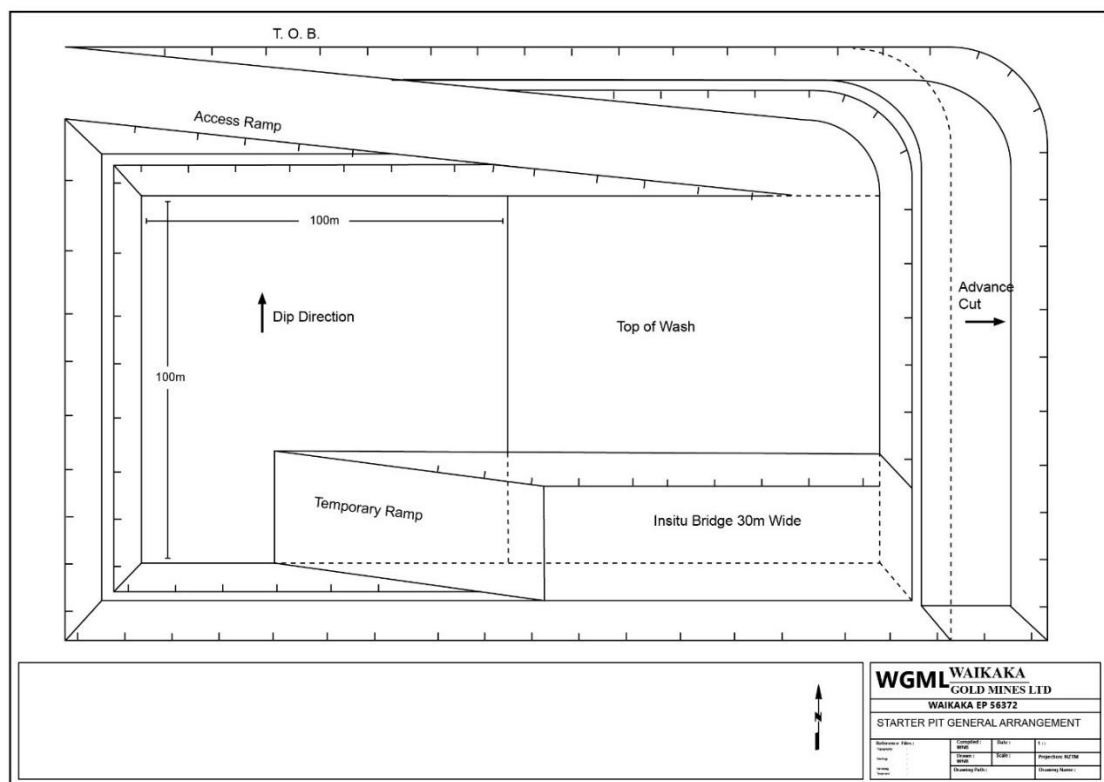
Waikaka starter pit general arrangement with overburden bridge concept
